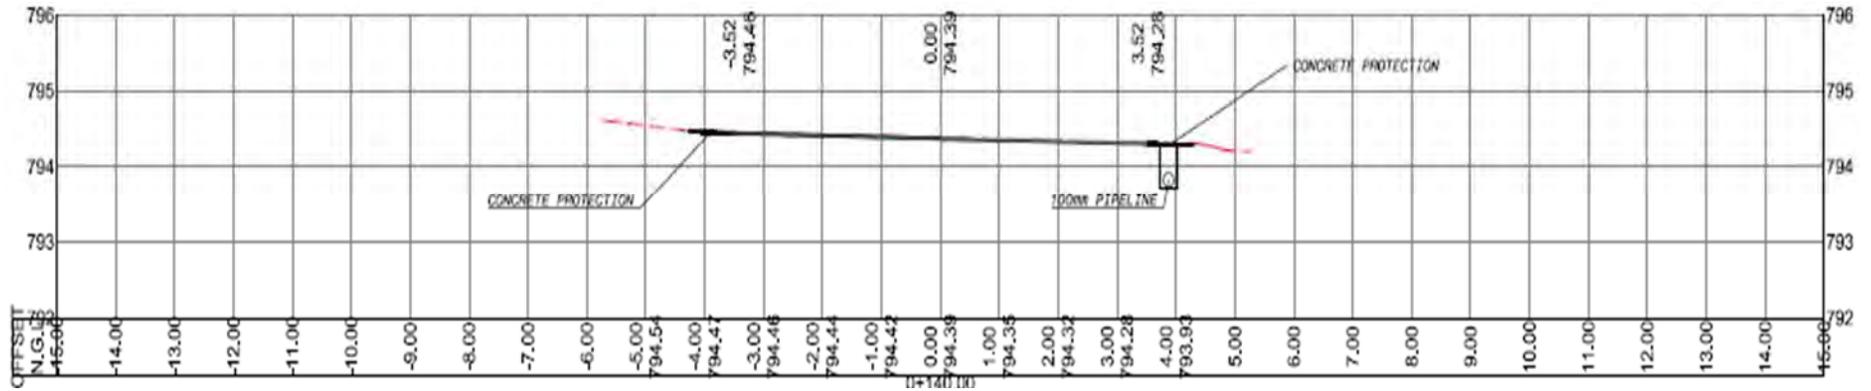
Segment A -As Built Cross Section at Sta.0+140
